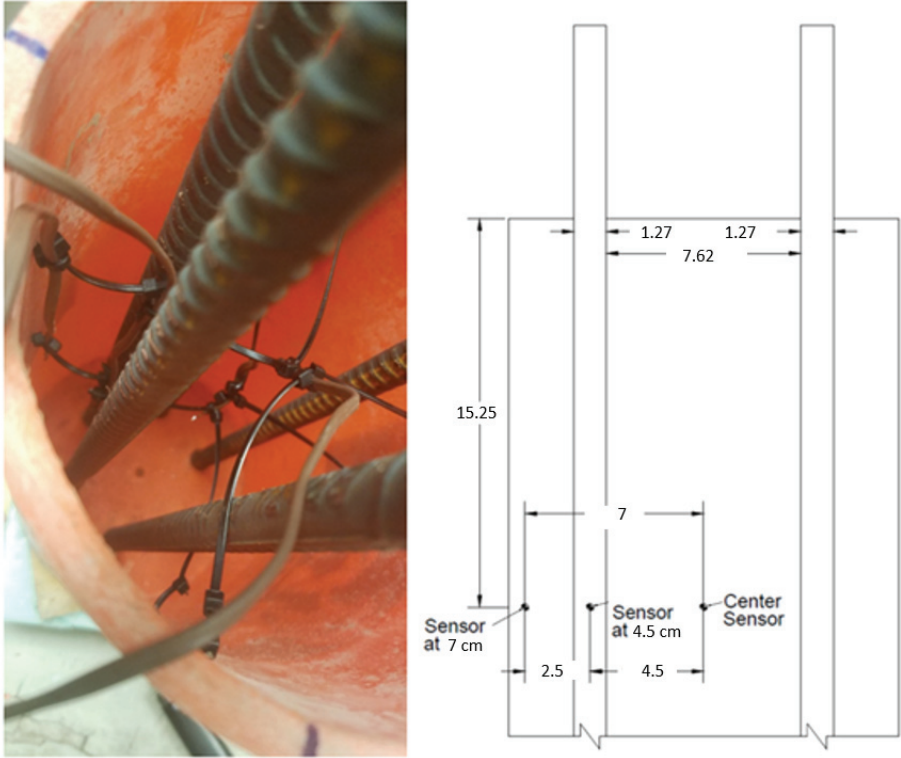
Specimens' layout of (a) Mortar + 6 steel rebars (b) Mortar + 11 steel rebars (Dimensions are in cm)
